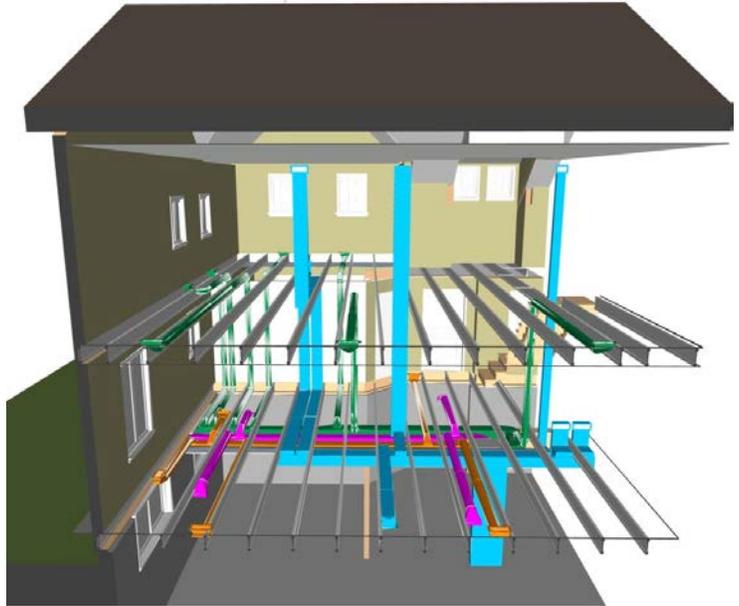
Example of coordinating the layout of ducts with the framing plan to minimize use of elbows
